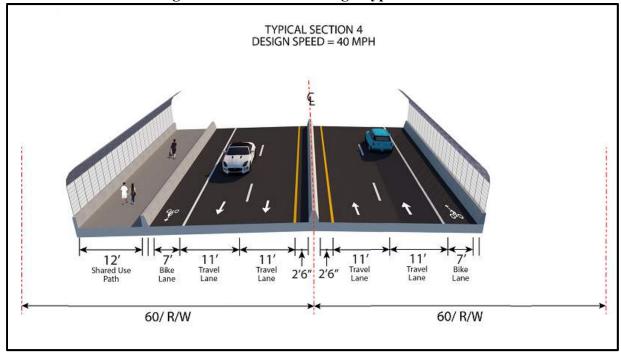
Four-lane Elevated Typical Section along N. Cattlemen Road
